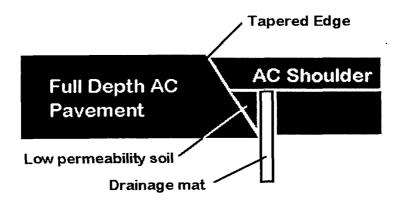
Observed 14" mat installation adjacent to full depth asphalt pavement.
